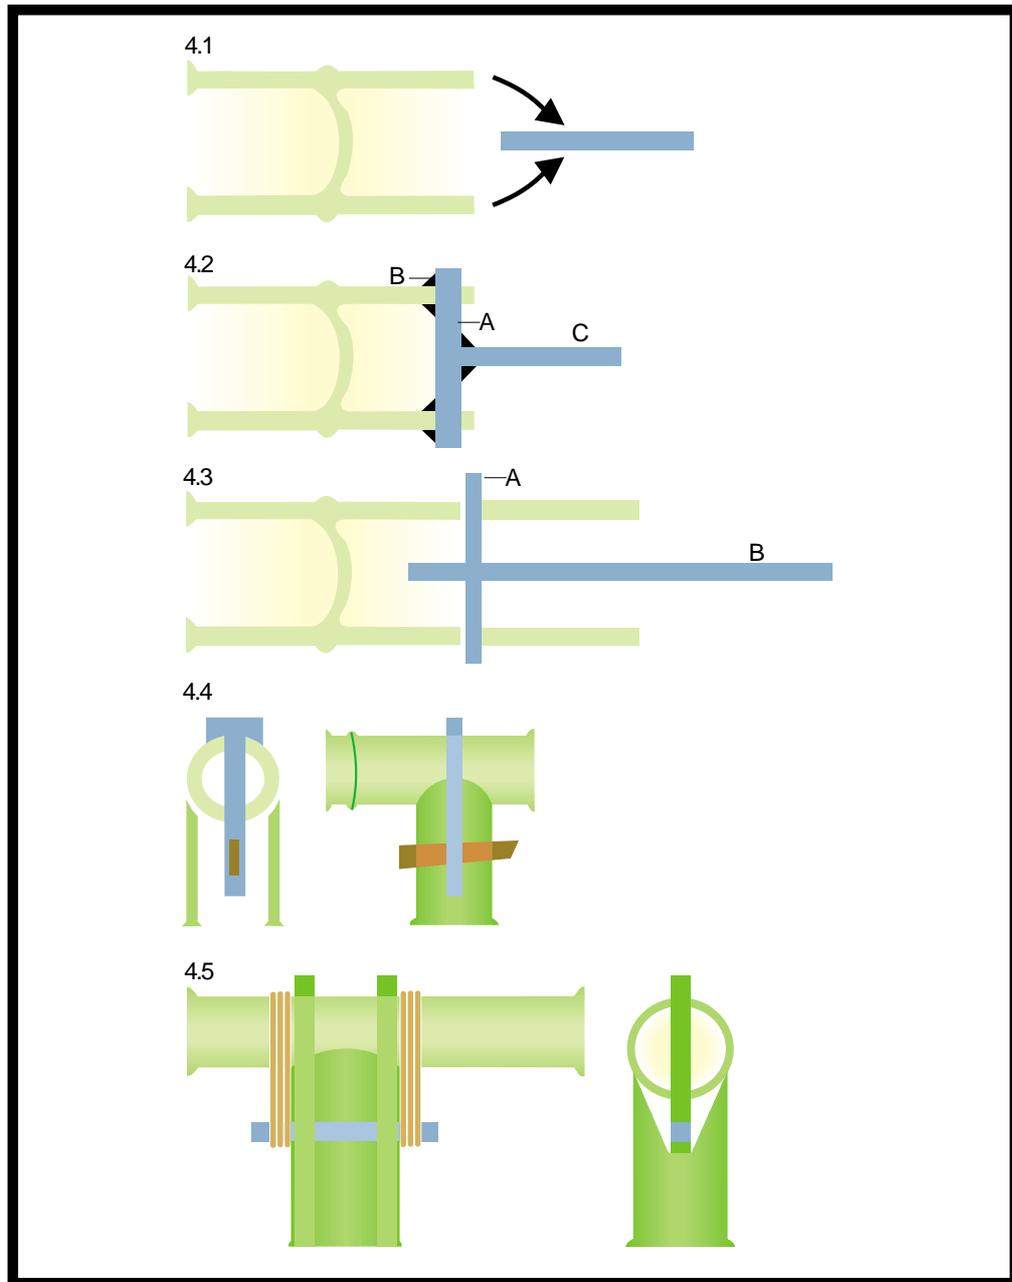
Joints from cross-section to an element parallel (Janssen 1981)
